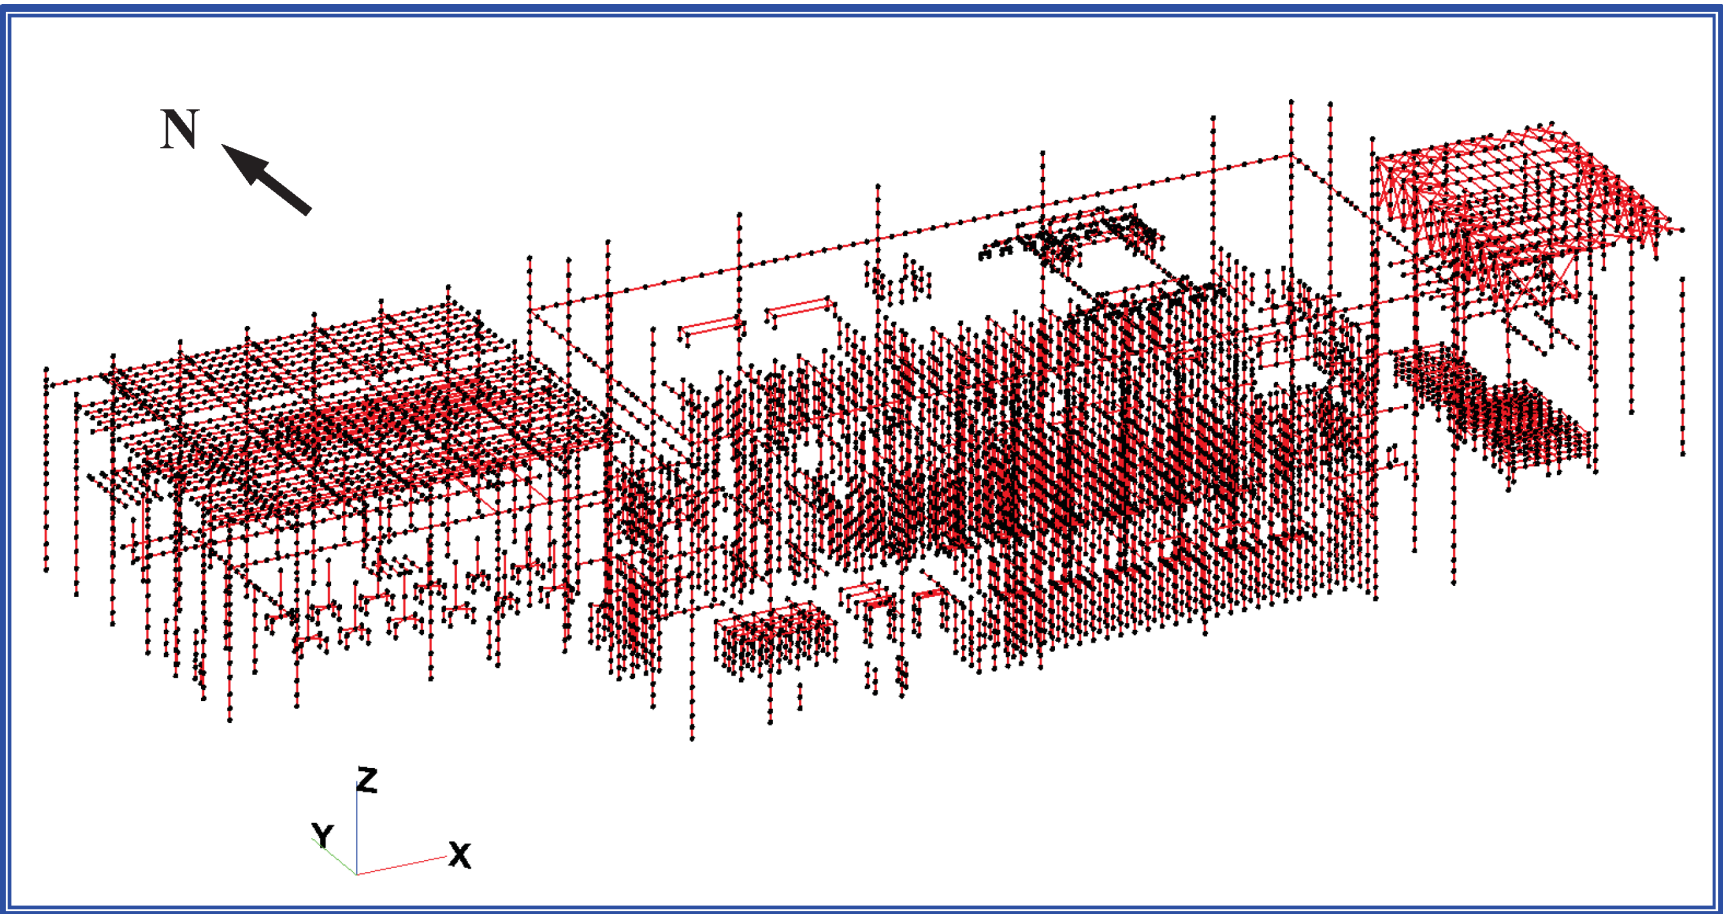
Beam Elements of SASSI2010 Triple Building Model
